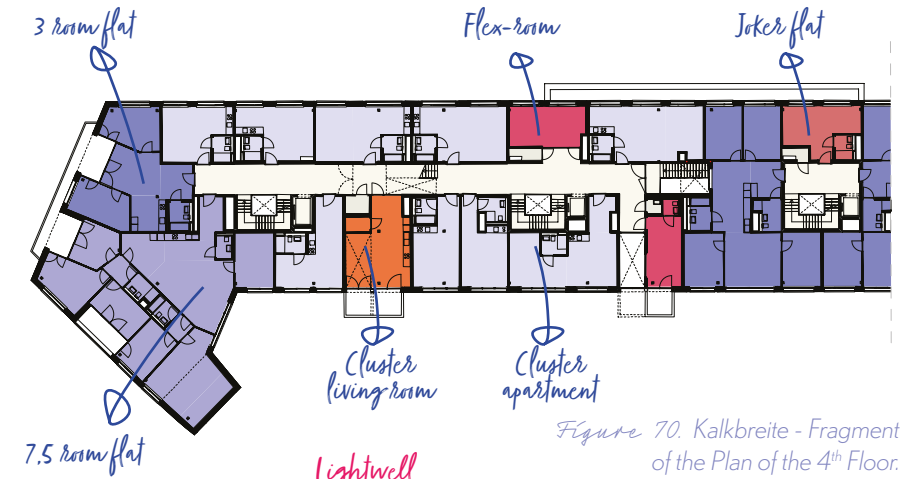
Kalkbreite - Fragment of the Plan of the 4th Floor.
